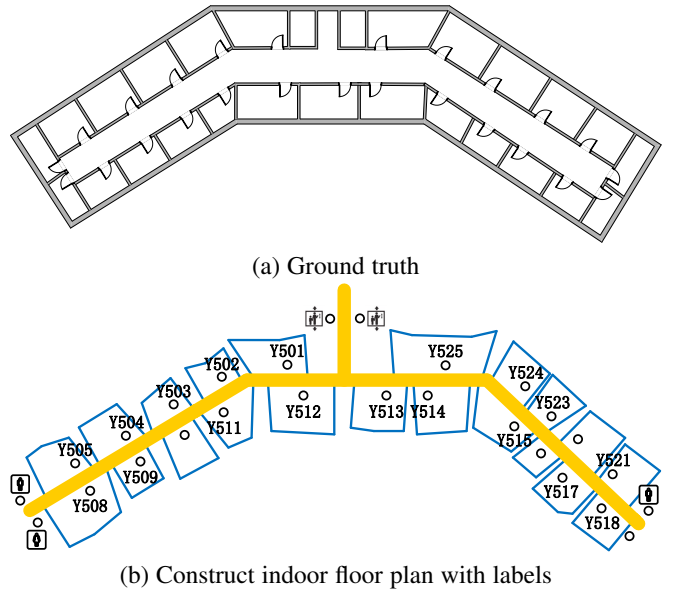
The Ground Truth and Constructed Indoor Floor Plan with Labels in the University Building.
